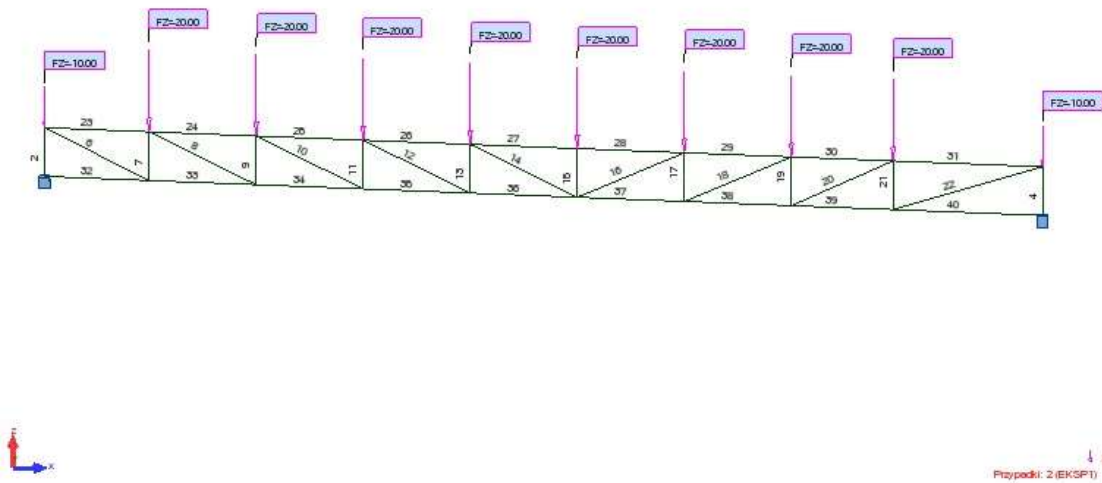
Truss with original shape and IPN cross-sections.
